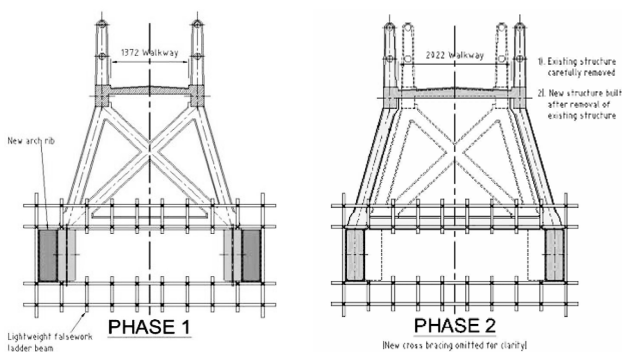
Sectional elevations through the bridge indicating the solution to use the existing ribs as falsework for the construction of new ribs. The new ribs would then be used to support demolition works on the old bridge.
